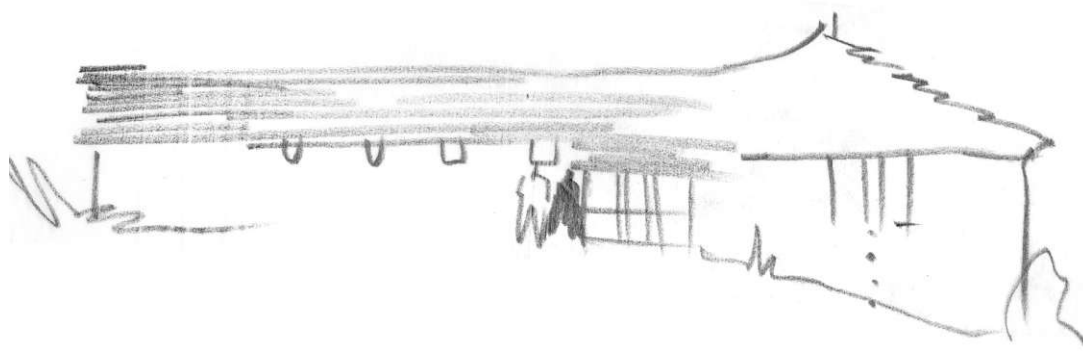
House in Wolfurt, 1951 - elevation sketch
